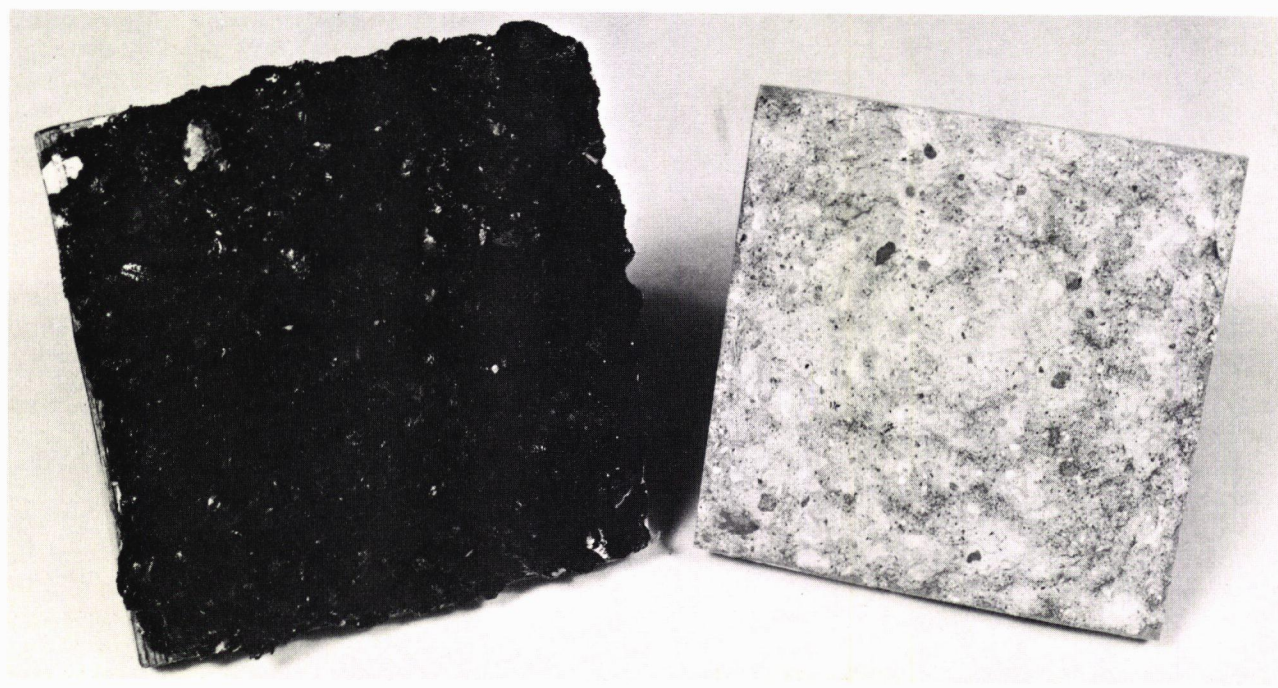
Characteristic adhesion failures on asphaltic concrete and portland cement concrete pavements.
